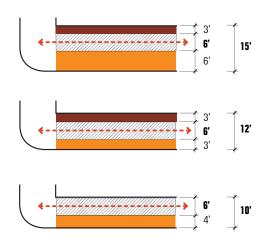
Effective Sidewalk Width – 6' Minimum Throughway Zone
